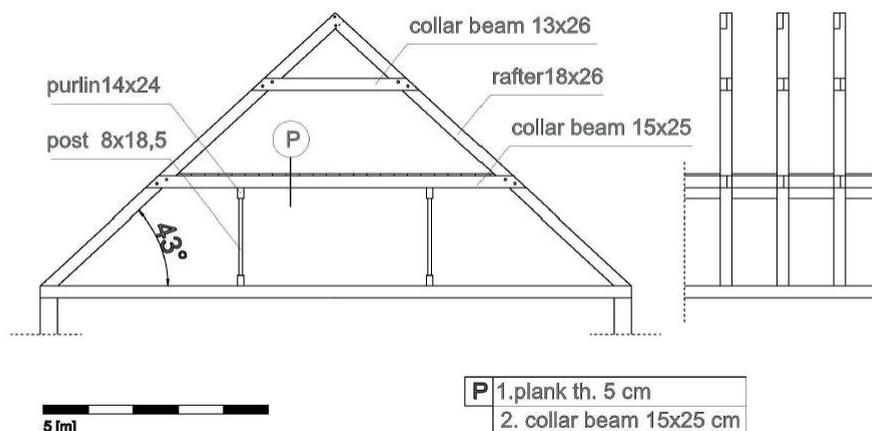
The simplified scheme of the roof structure of the arcaded house in Marynowy. (author's study)
